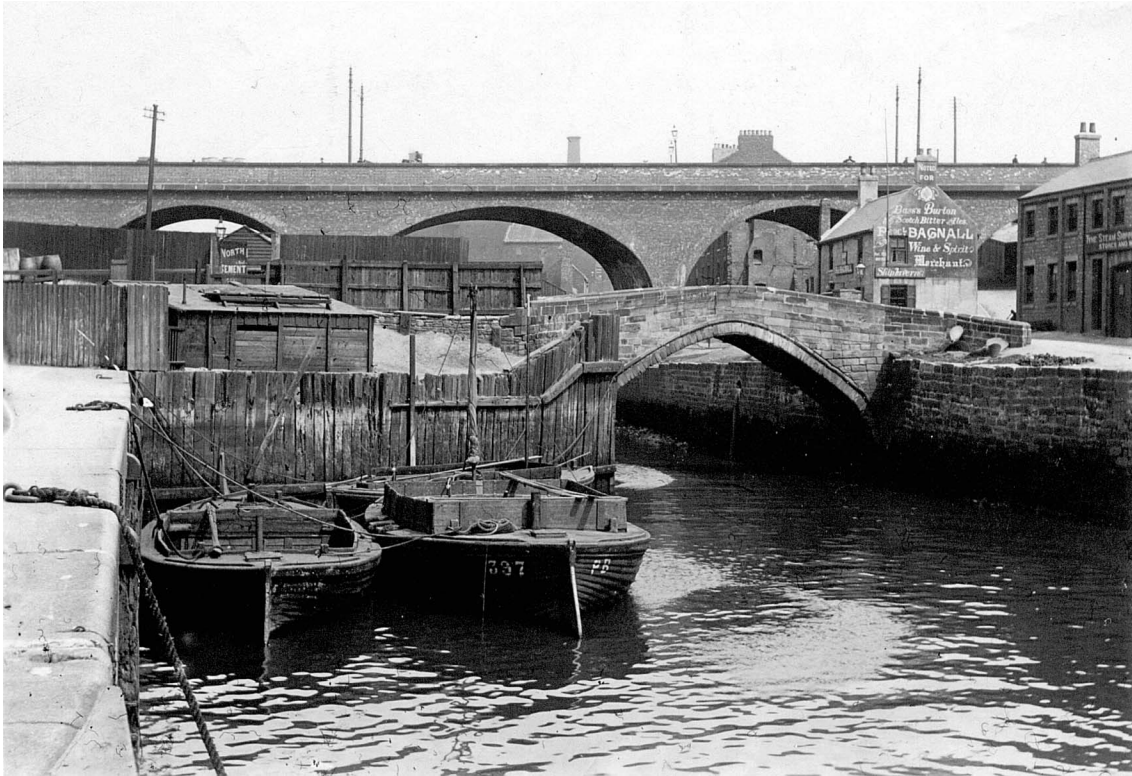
The old and new Glasshouse Bridges. The new bridge is located in the background, to the north of the earlier structure. [Newcastle City Library]
